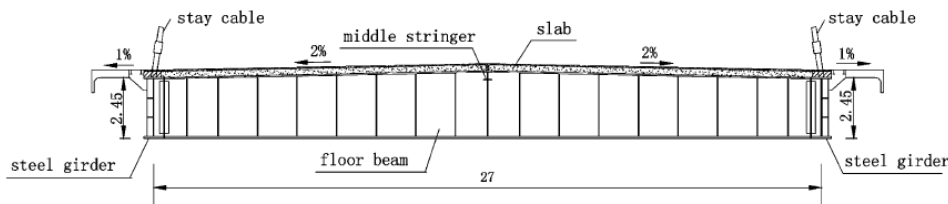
Typical cross-section of composite deck of Qingzhou Bridge . (Unit: m)
